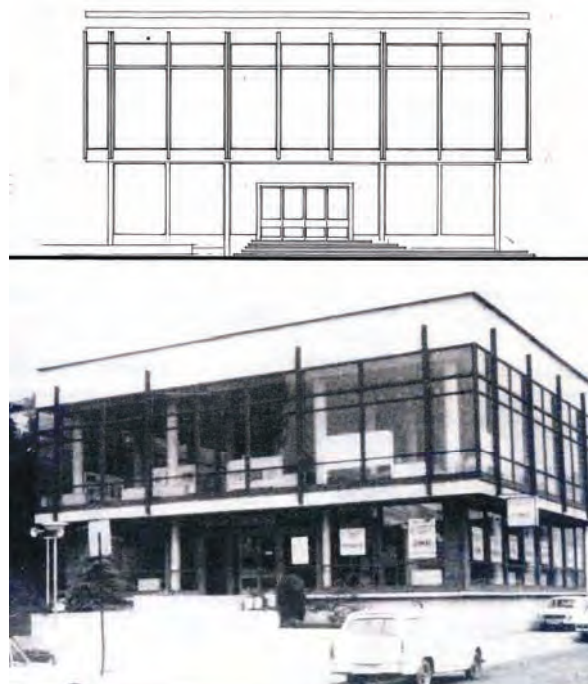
The elevation (above) and photo (below) of the entrance façade of the 1967 design (©Yüksel Umuter Archive)
